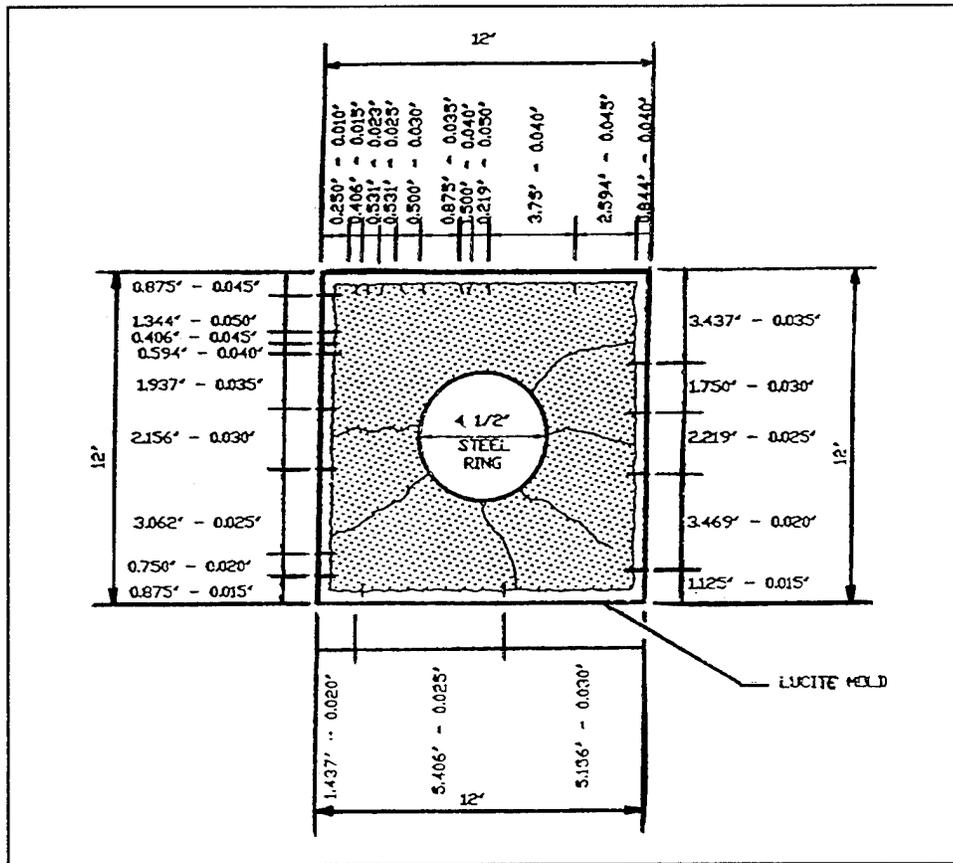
Typical specimen for measurement of shrinkage crack area (1 in. = 25.4) (Padron and Zollo 1990)
